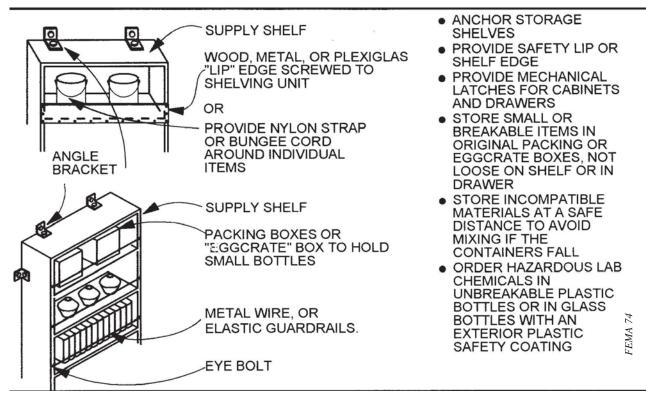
Secure storage units from toppling by connecting them to walls. Keep contents from falling off shelves with lips or guardrails.
